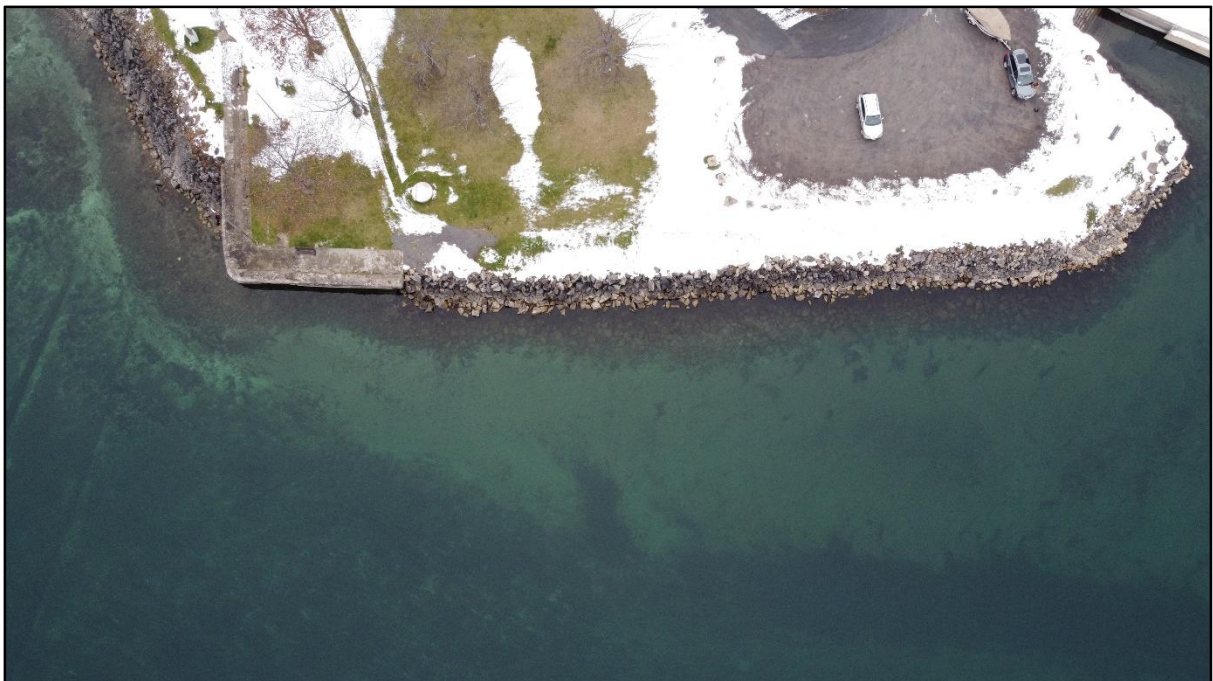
SE shoreline - parapet foundation undermined; face of wall top left
